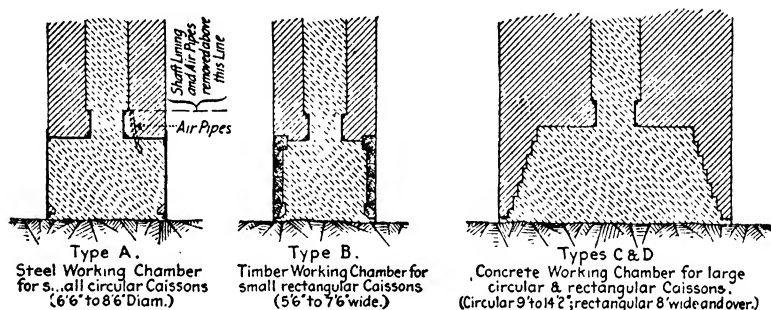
Types of Working Chambers, Municipal Building, New York.
